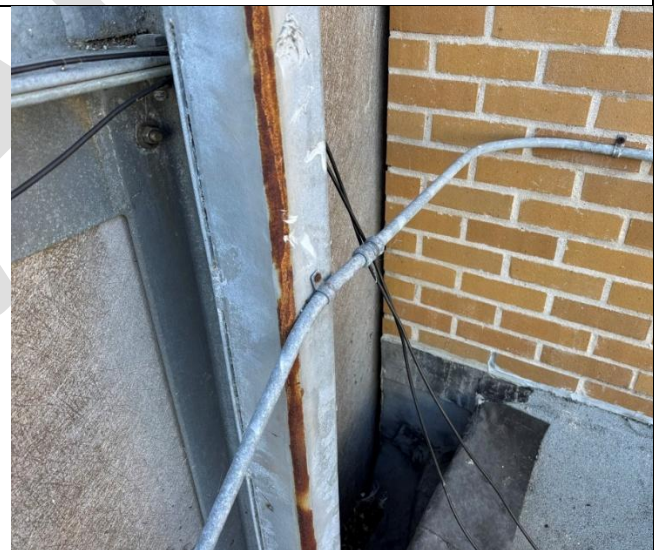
Minor surface corrosion of tube steel frame of FRP/fiberglass panelized parapet system
